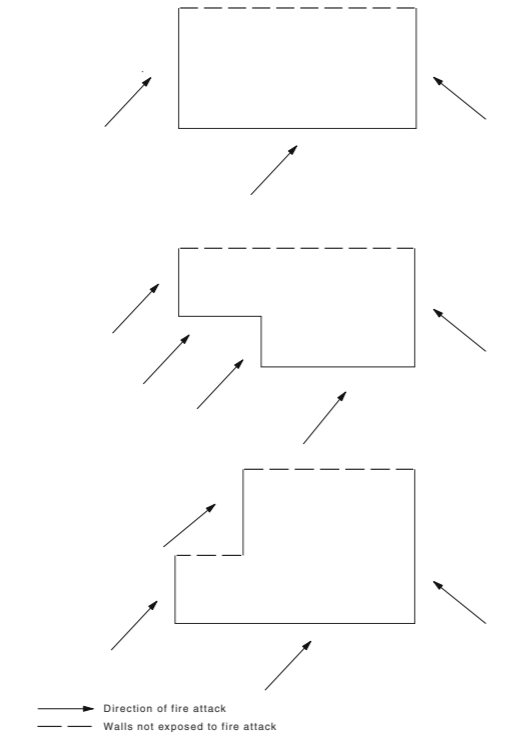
EXAMPLES OF WALLS SUBJECT TO SHIELDING
